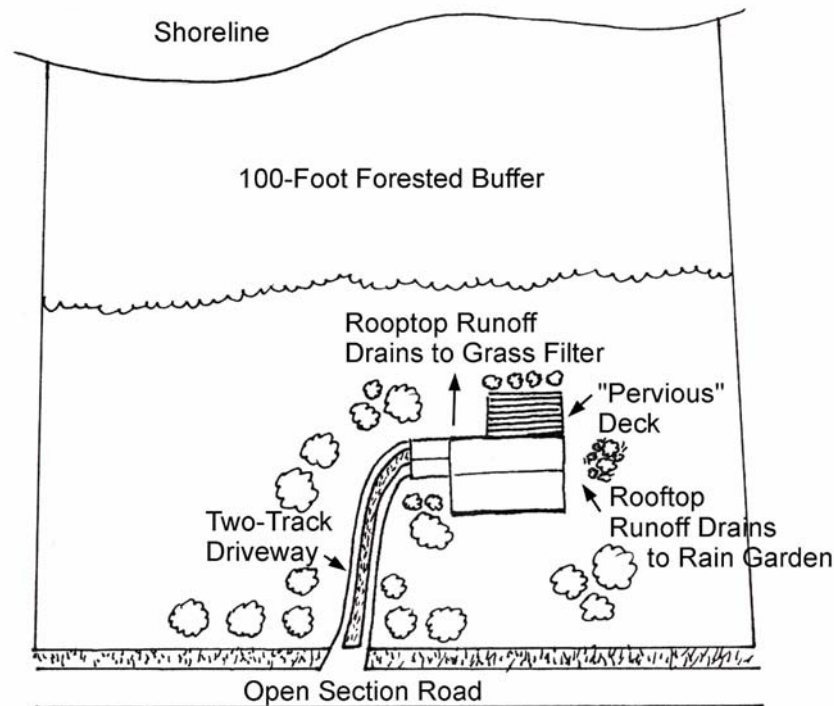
Illustrative Example of How Multiple Non-structural Stormwater Techniques Can be Applied at a Residential Site
